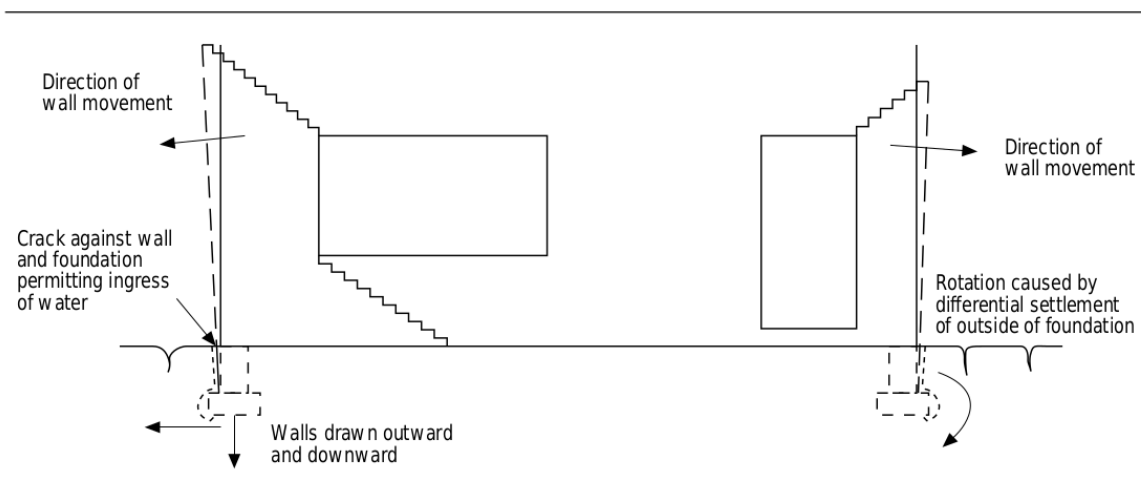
Building damage mechanism associated with shallow foundations in shrinkable clay. Figure from Page [1998].
